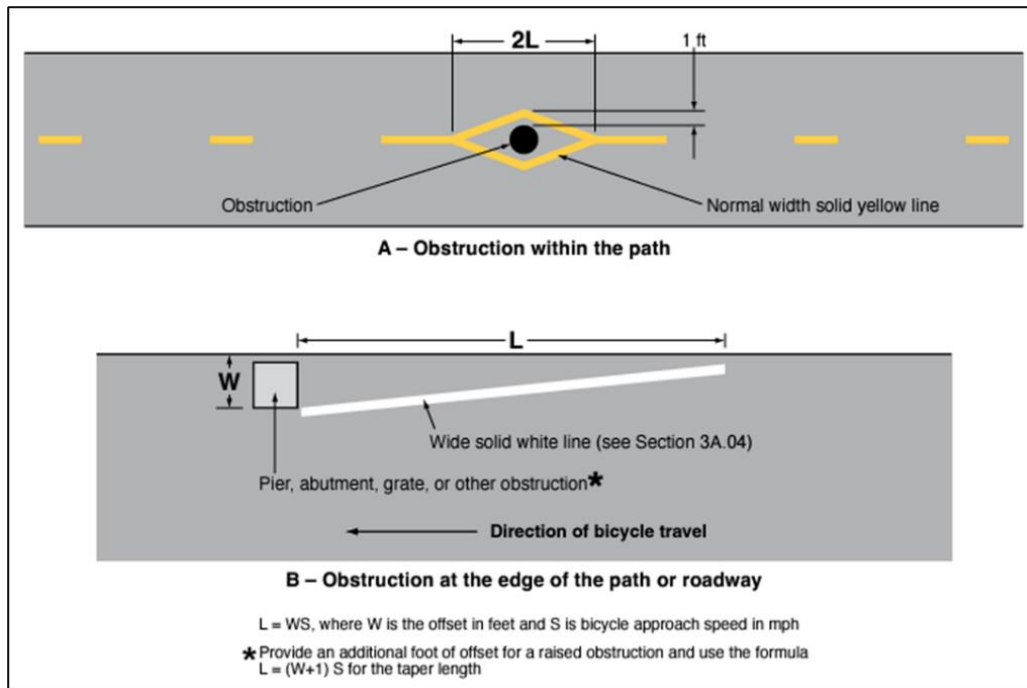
Examples of Obstruction Pavement Markings, Image from FHWA MUTCD (11th Edition, 2023)
